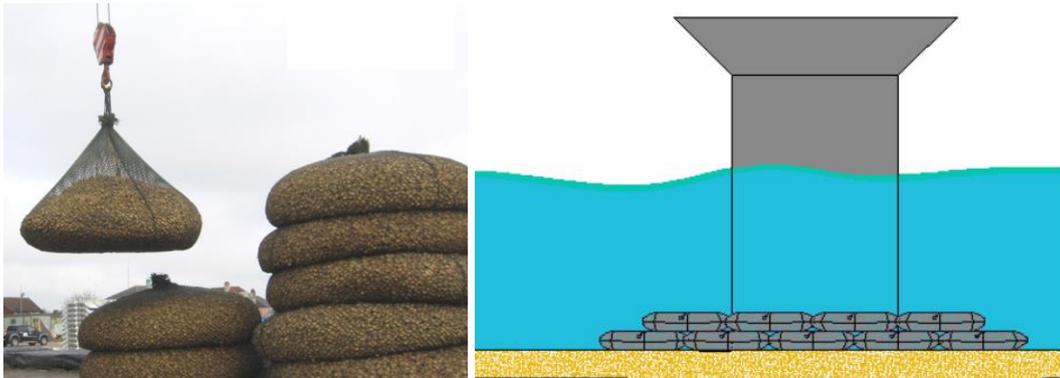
(left) Example of filter unit (right) illustration of rock bags around a monopile [source: Subsea Protection Systems, <http://www.subseaprotectionsystems.co.uk/images/downloads/Rock%20Filter%20Units%20-%20Offshore.pdf>].
